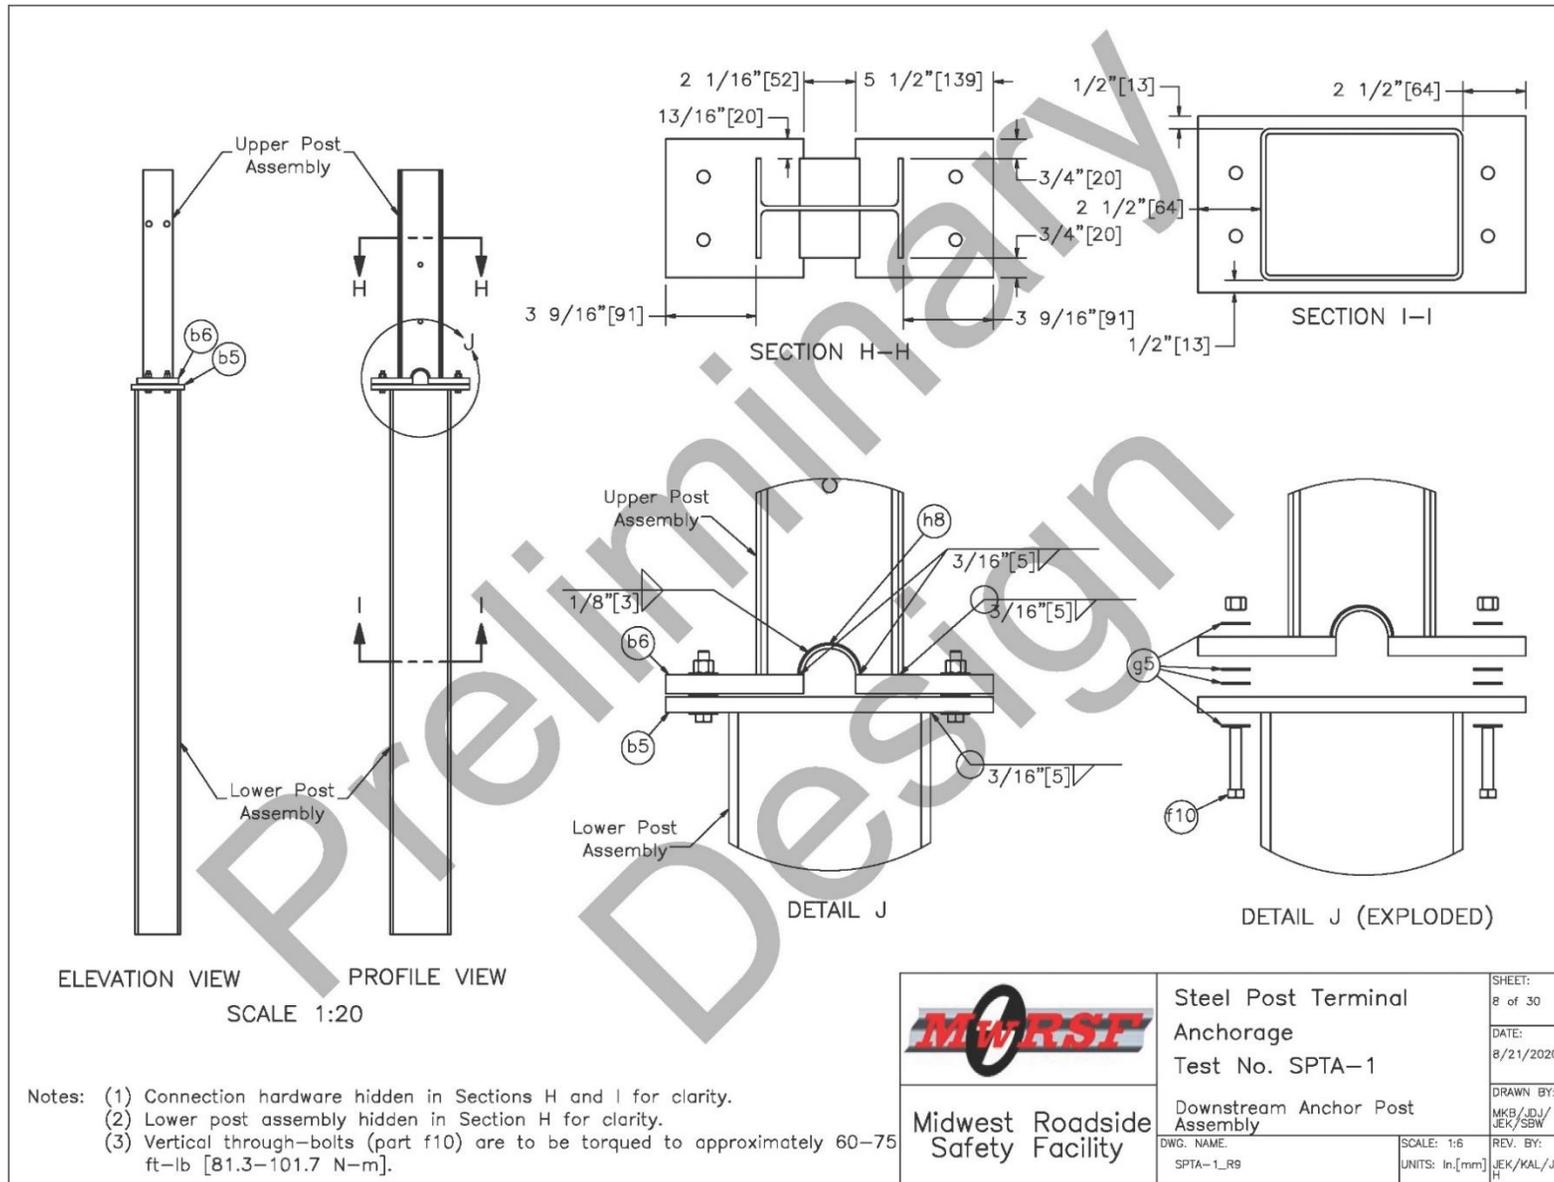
Downstream Anchor Post Assembly, Test No. SPTA-1
